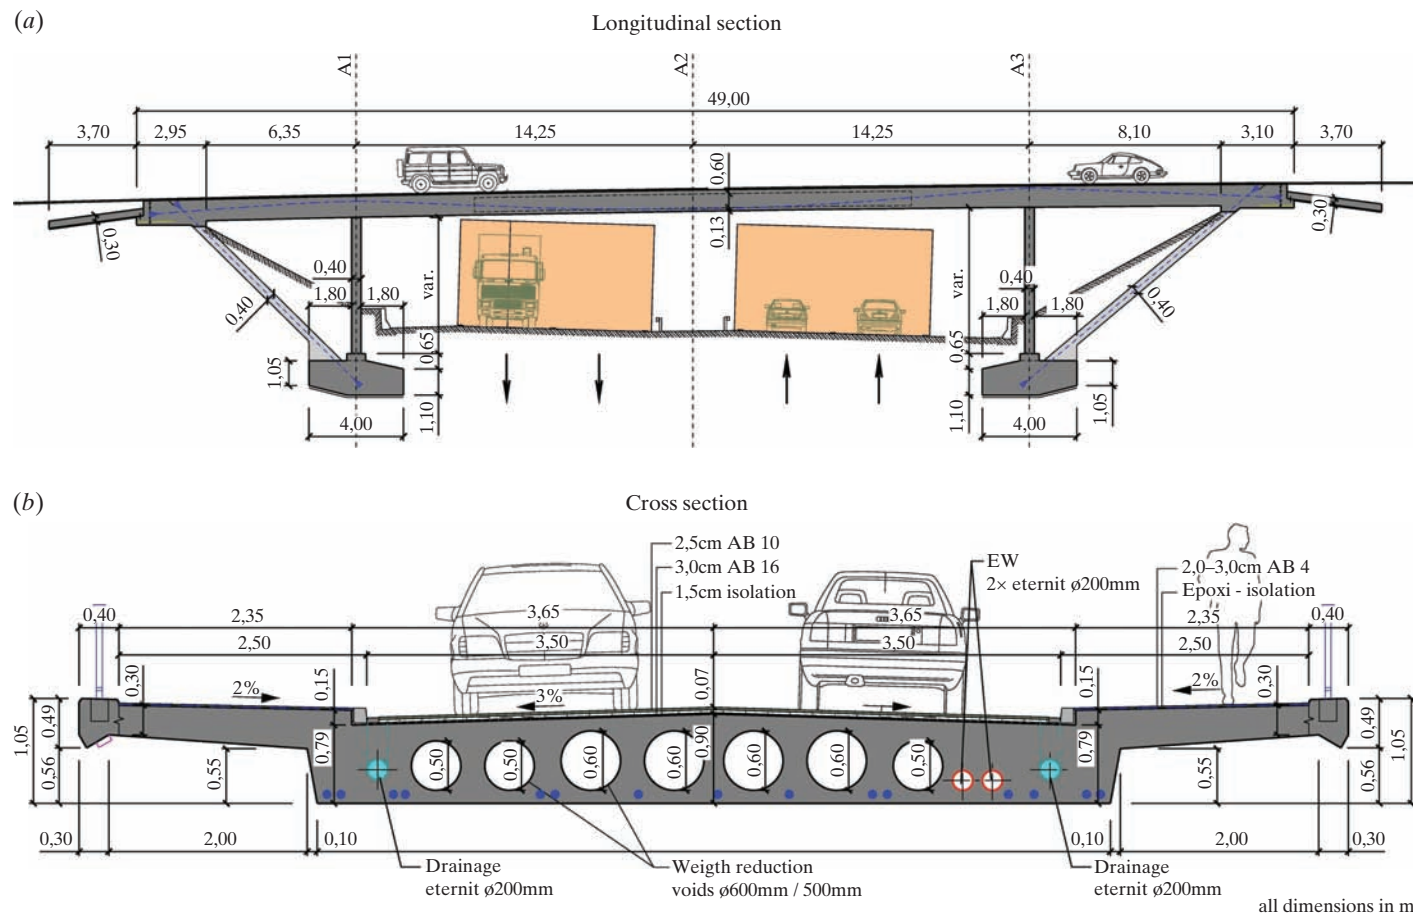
Example of buried tensile elements in the slopes of the highway (a) and not accessible voids in slab bridges (b)
